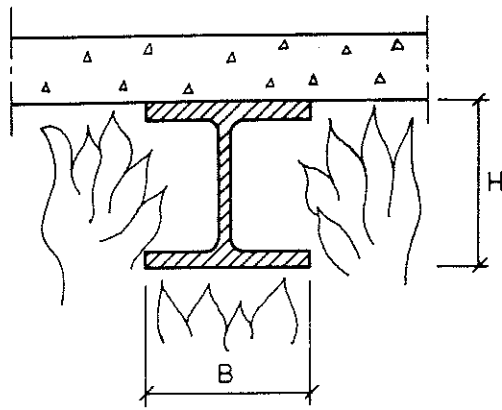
Floor assembly where the flames penetrate between the steel beams
